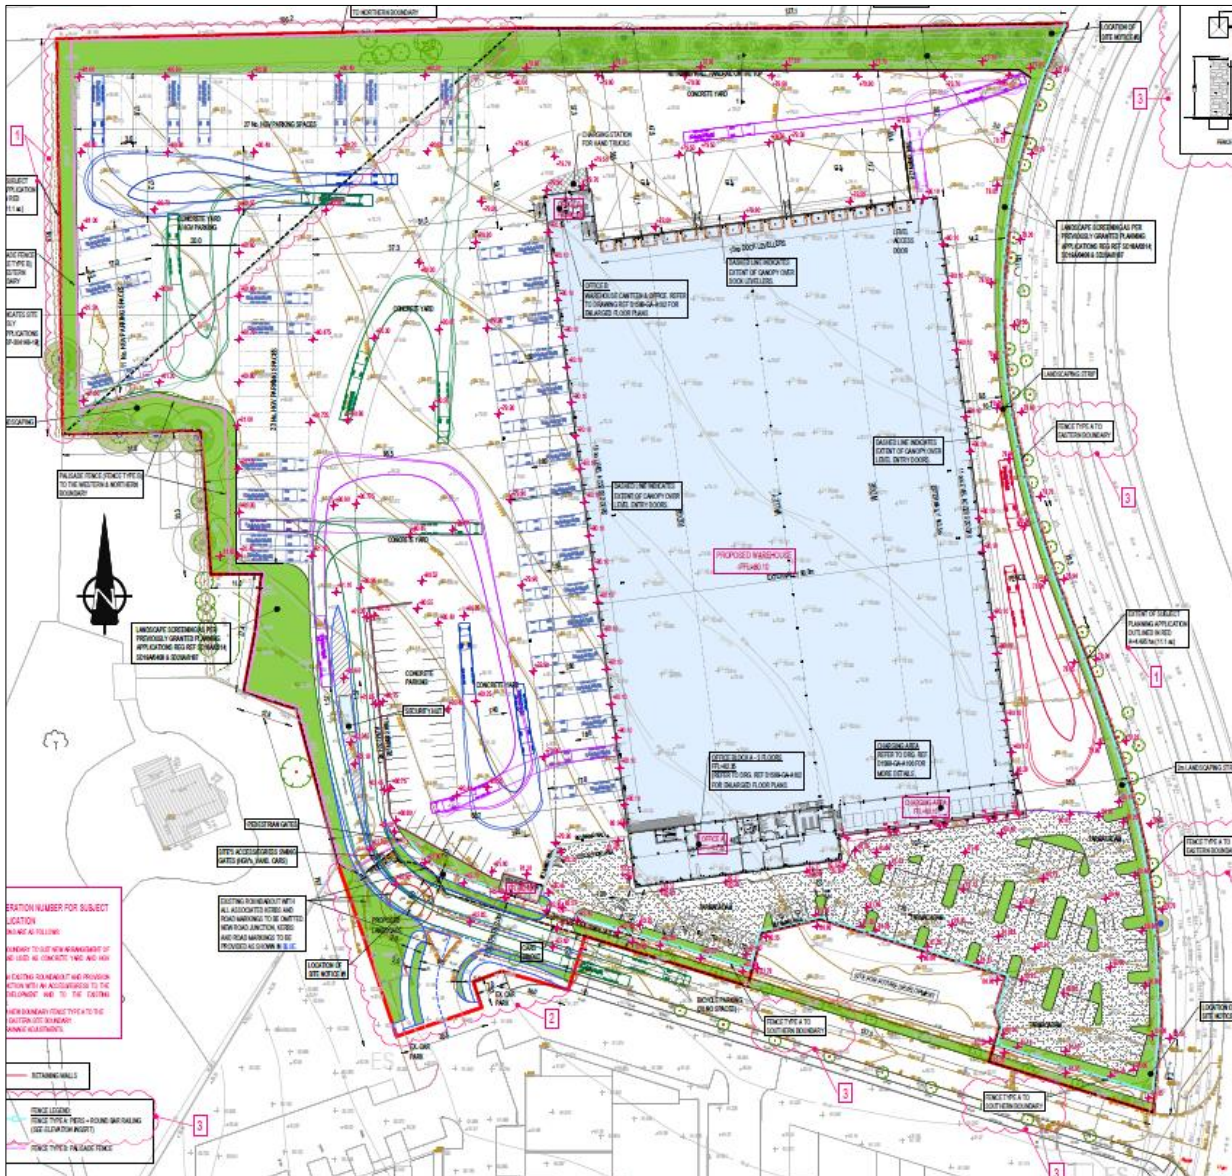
Layout of Scheme that was refused permission due to incorrect zoning on the triangular portion to the north-west of the site. This is the layout that will be lodged if the subject site is rezoned, facilitating the provision of additional parking on site.
